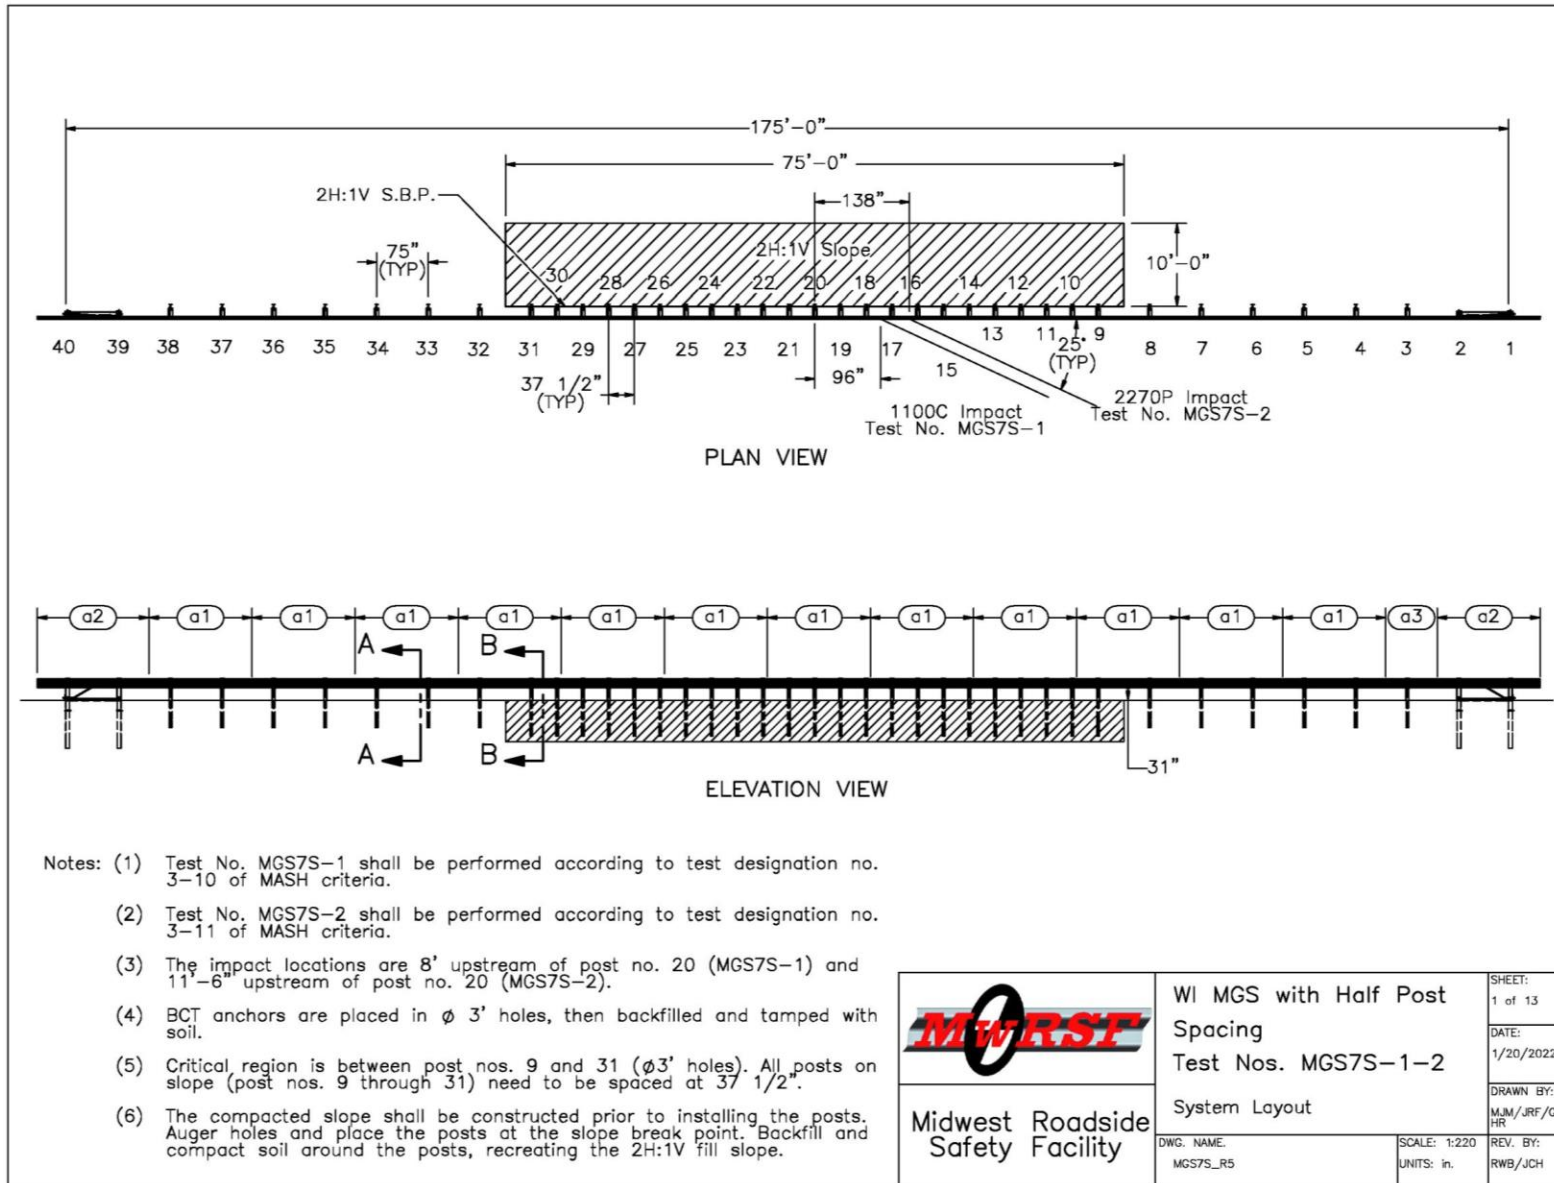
Test Installation Layout, Test Nos. MGS7S-1 and MGS7S-2
